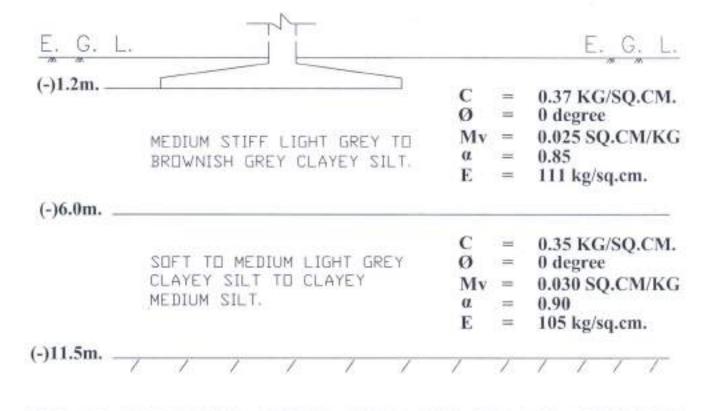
, FOUNDATION DESIGN MODEL FOR SHALLOW FOOTINGS.
